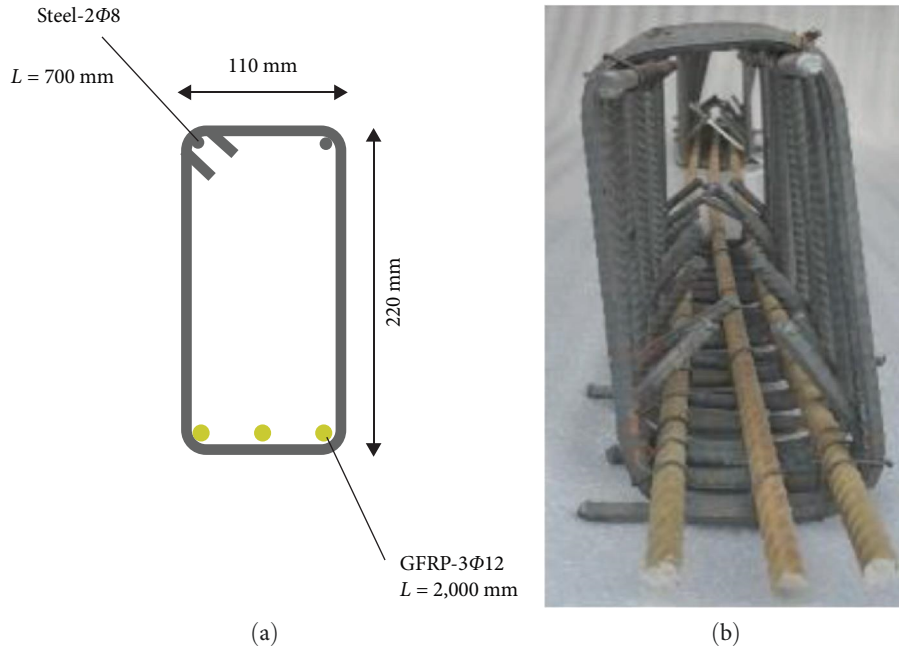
Stirrups of specimens: (a) schematic of stirrups; (b) used stirrups.
